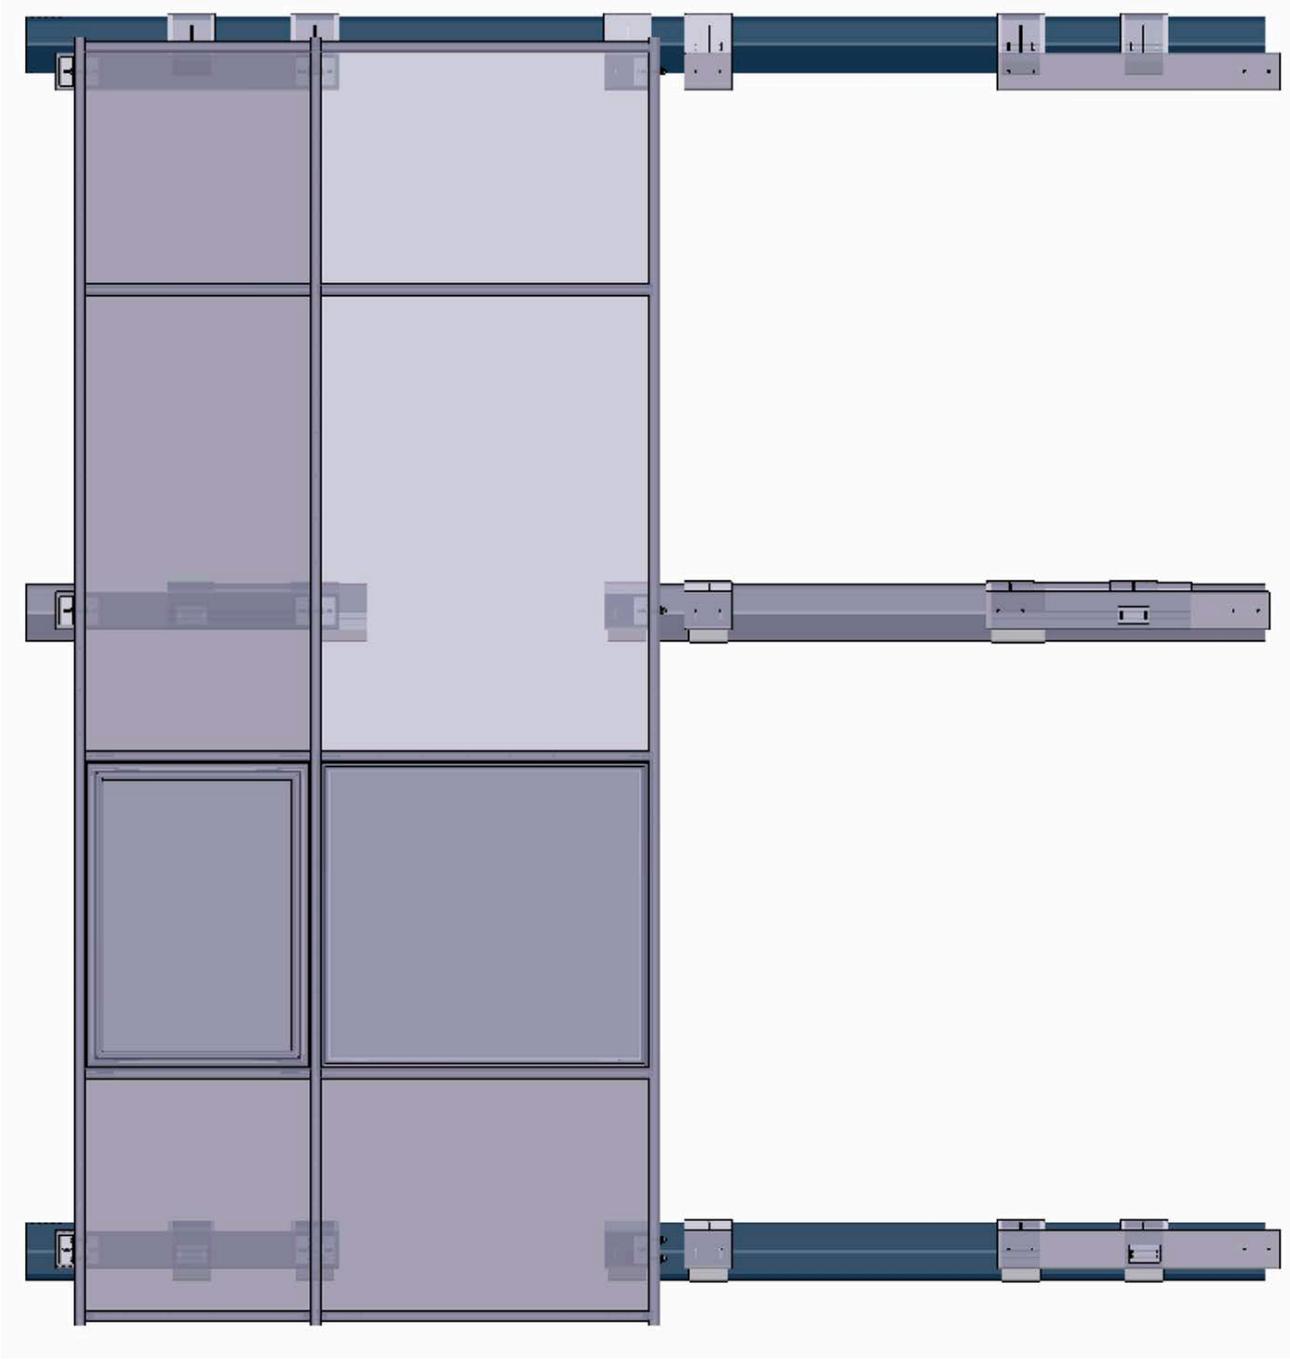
Mock-Up modelling with single-axis strut and structural system of the test chamber of the TCLab section of the Building Future Lab
